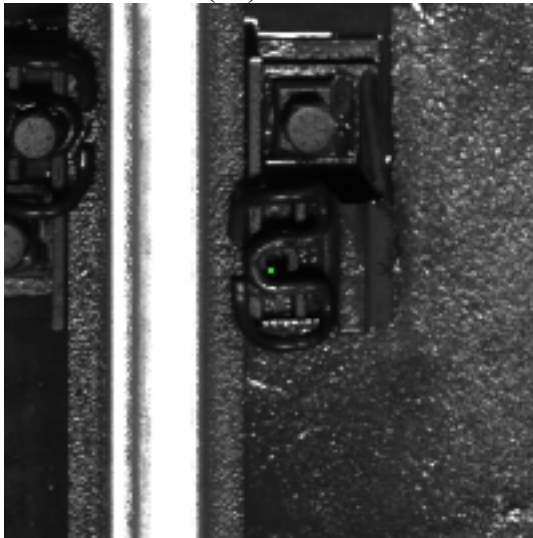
Inspected defects in the elevated section after rain. Up direction left rail (IV).
